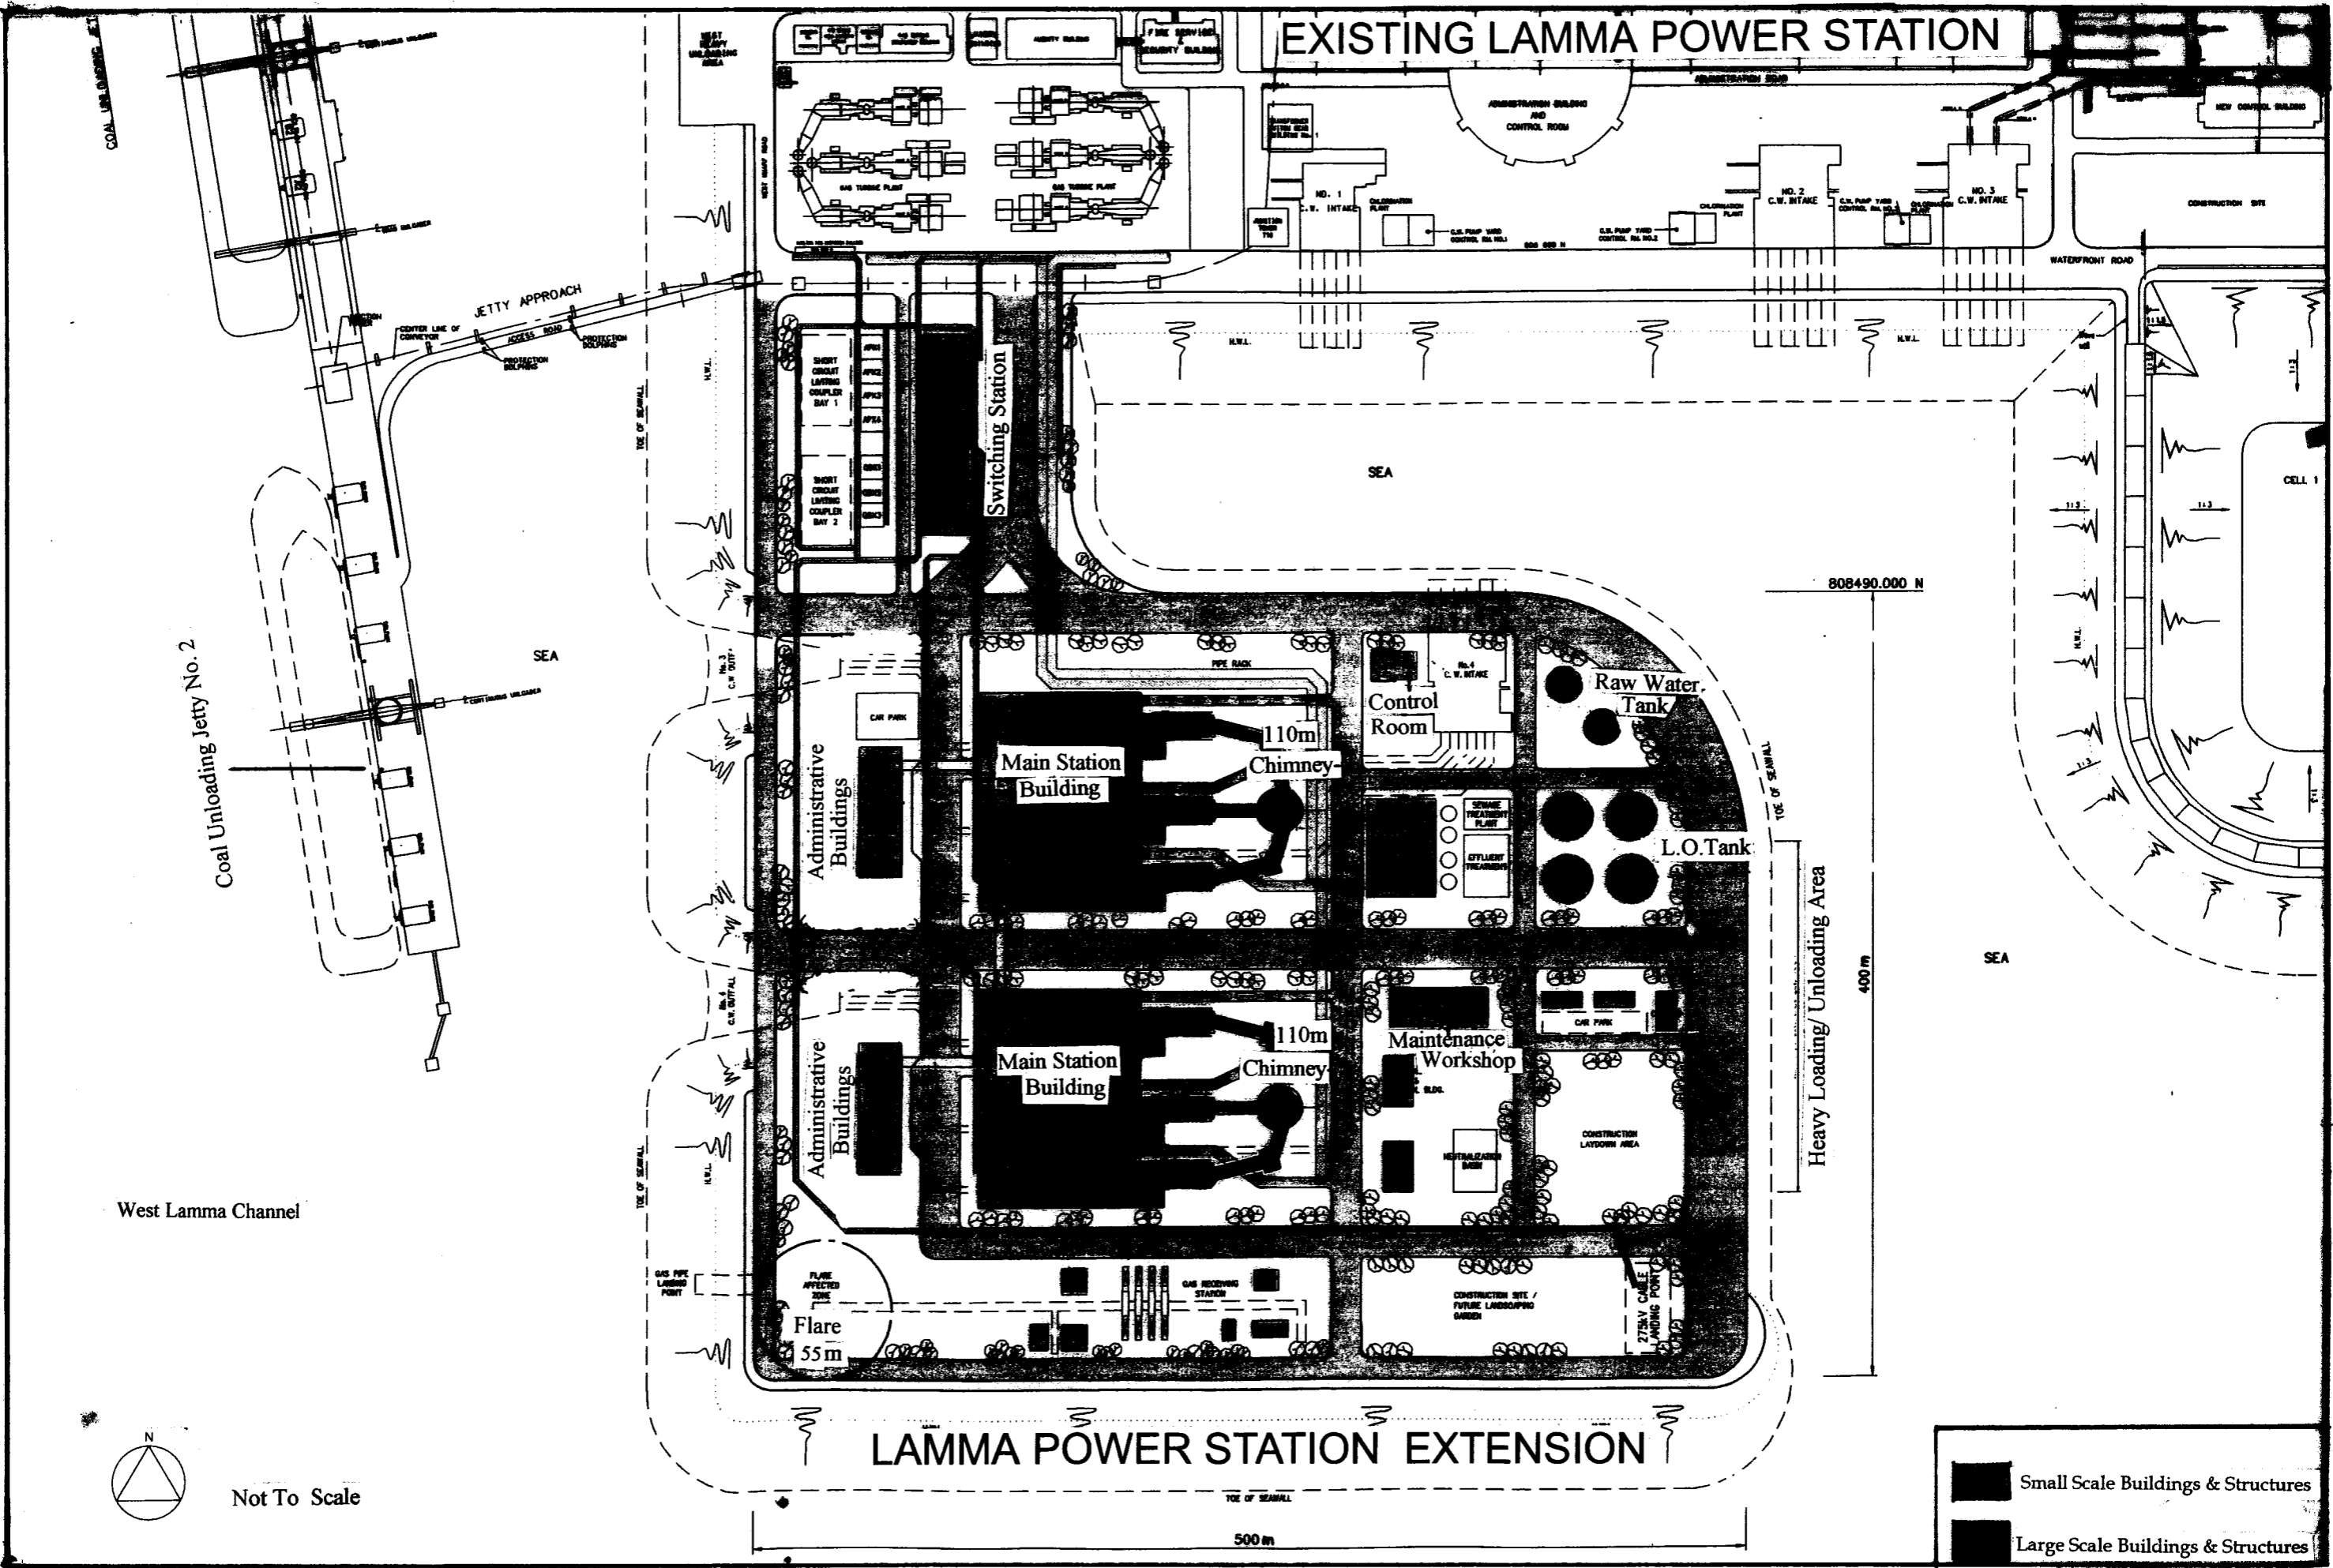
SITE PLAN OF PROPOSED EXTENSION
